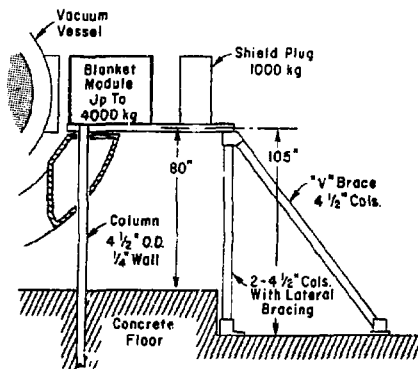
shows the basic structure of the ETS. The ETS platform is supported by 3 steel posts attached to the Test Cell Floor. The inboard column utilizes the existing 15-cm hole in the lower shear-compression panel between TF coils.¹ The platform and test module pallet are constructed of fiberglass to eliminate electromagnetic interaction with the pulsed tokamak fields. (Radiation damage to the fiberglass will be negligible for TFTR fluences.) Seismic loads are taken up by diagonal struts attached to the Test Cell floor outboard of the ETS. There is no attachment to any component of the TFTR.
